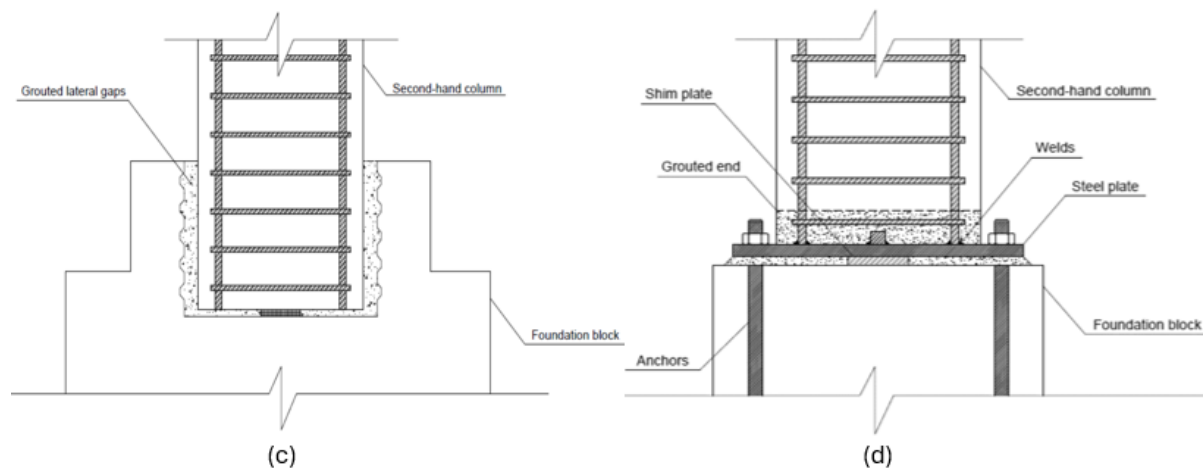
Design proposals for reconnecting a reused column to a foundation block (Volkov, 2019) (continued)
